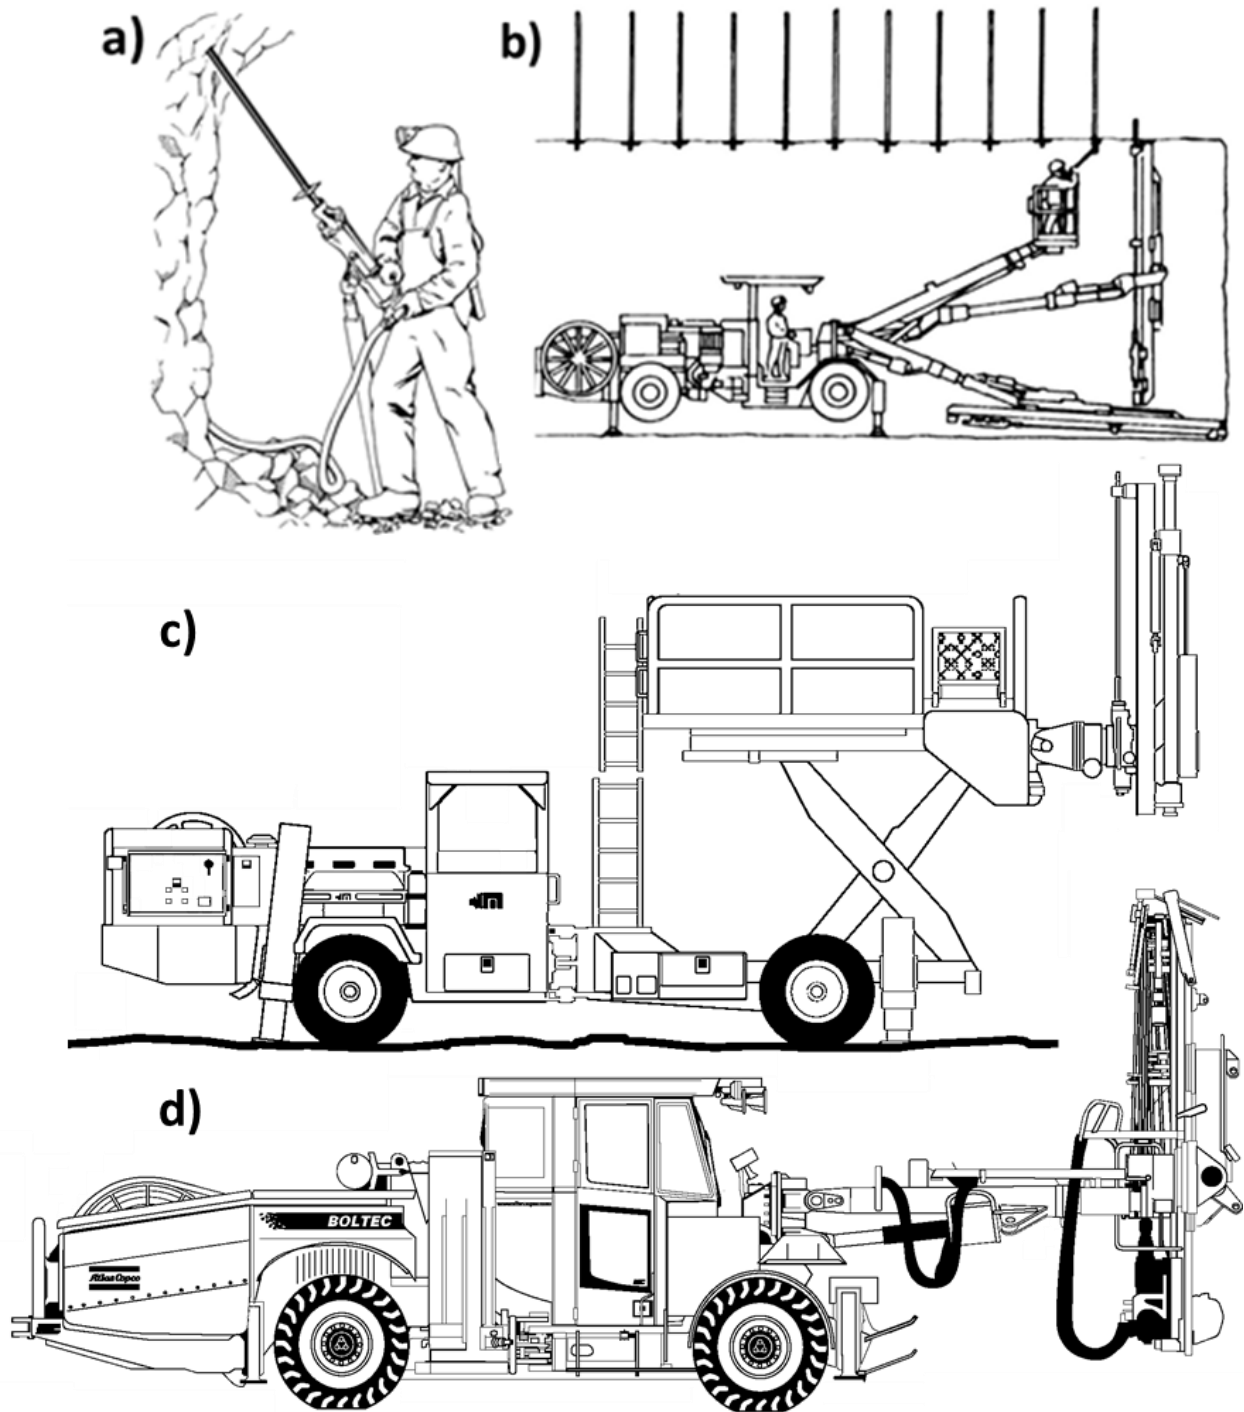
a) Manual bolting (Stillborg, 1994), b) Semi-mechanized bolting with two operators (Stillborg, 1994) c) Semi-mechanized bolter, single operator (MacLean Engineering, 2015); d) Mechanized bolter (Atlas Copco, 2015)
